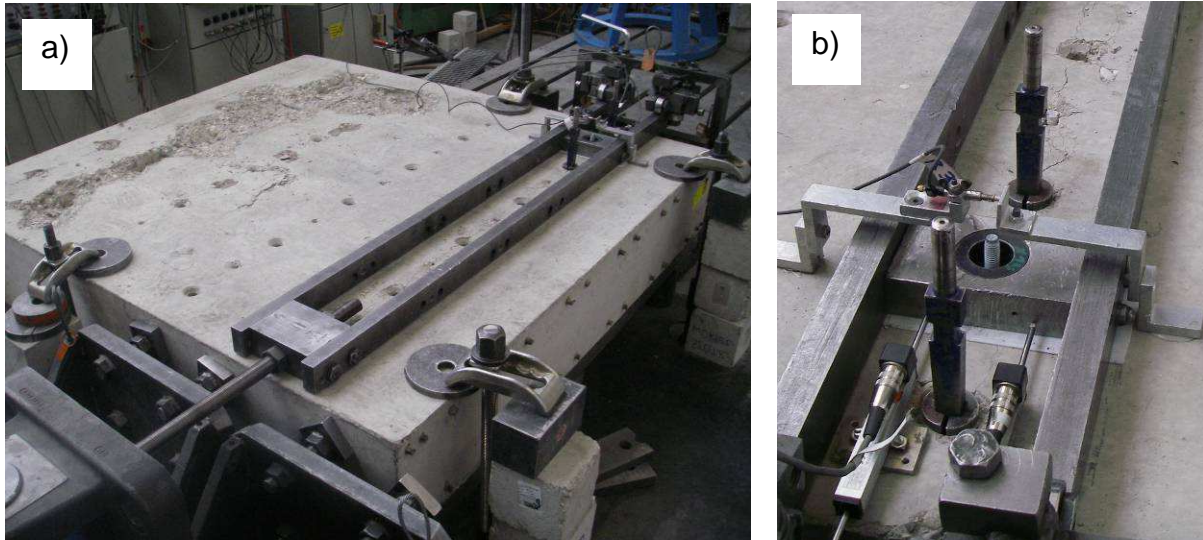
a) Loading device resting on wedge-split concrete slab and mechanically held down by a guiding frame (left) and the actuator (right); b) Close-up of installed anchor, fixture with brushing, and anchor displacement and crack width transducers
